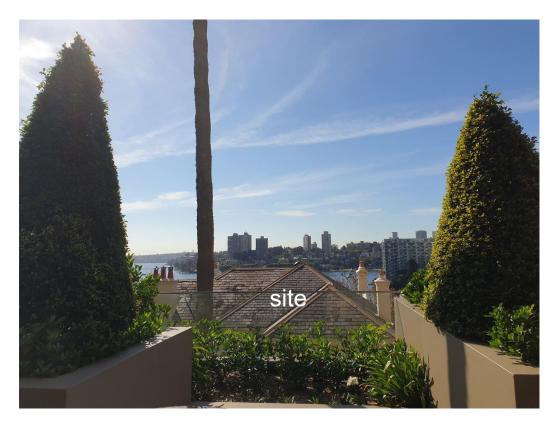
Photograph from a standing position within the communal open space at the rear of the 'Pomeroy' building at 14 Macleay Street, Potts Point, looking east
